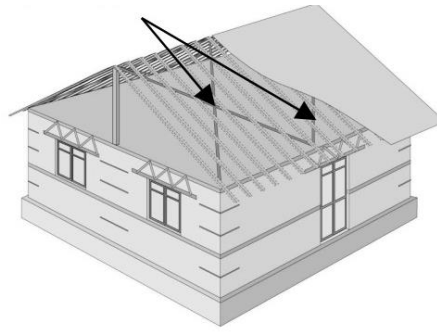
Diagonal reinforcement disposition, by CAESI⁸
